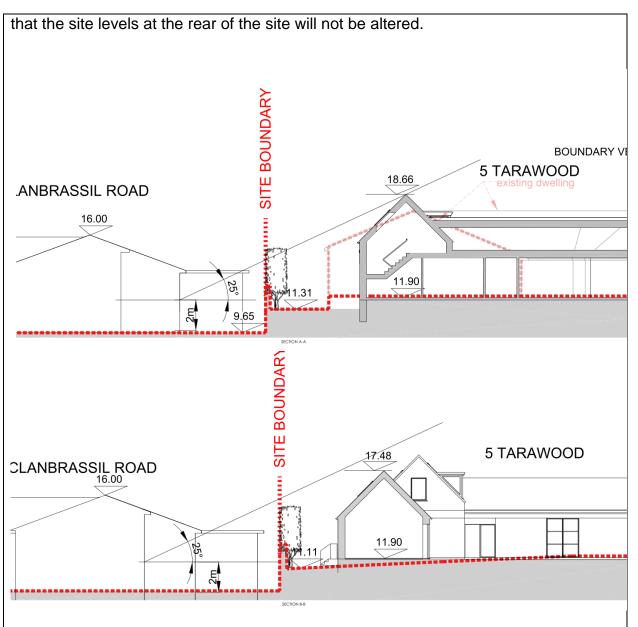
Sections showing existing and proposed dwelling outline and neighbouring building, 13 Clanbrassil Road.
